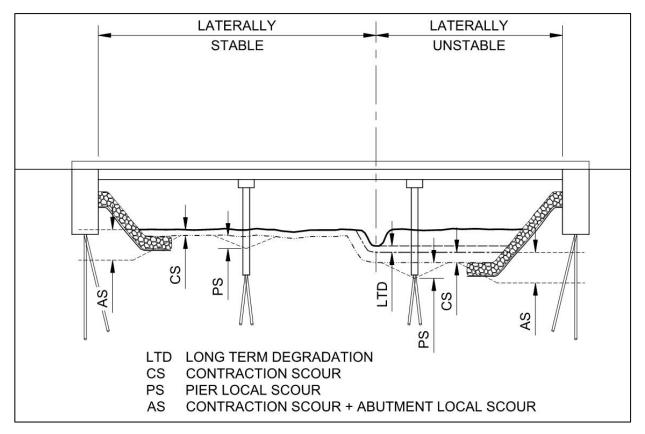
Example bridge opening cross-section with abutment scour countermeasures protecting spill through slopes. (Figure after Idaho Transportation Department, 2021).
